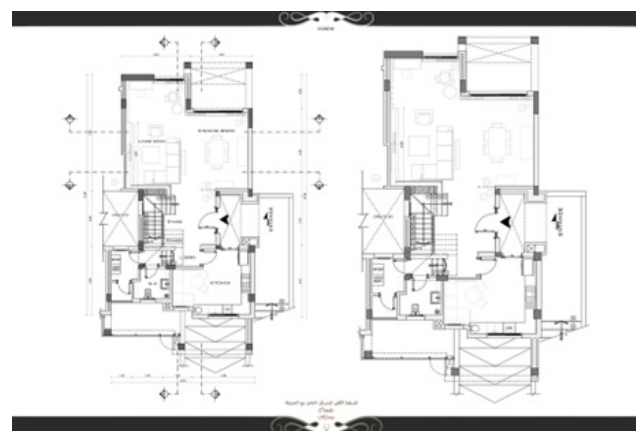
((Author, 2018)): The furniture floor plan of a condo.
